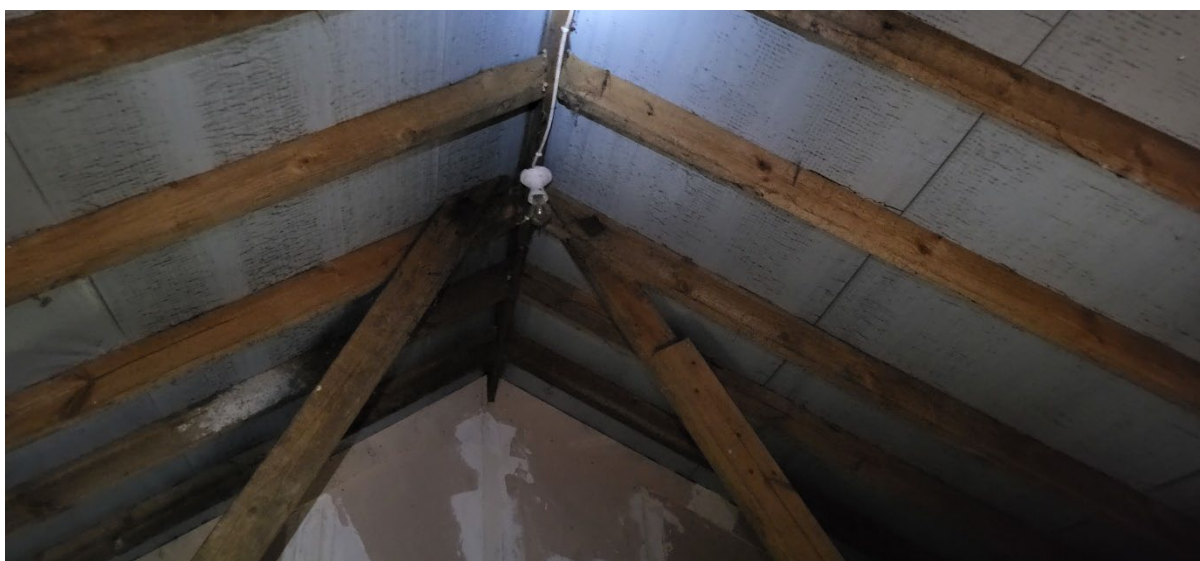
Roof structure of roof voids 1 and 2. Impermeable plastic liner and timber frame
